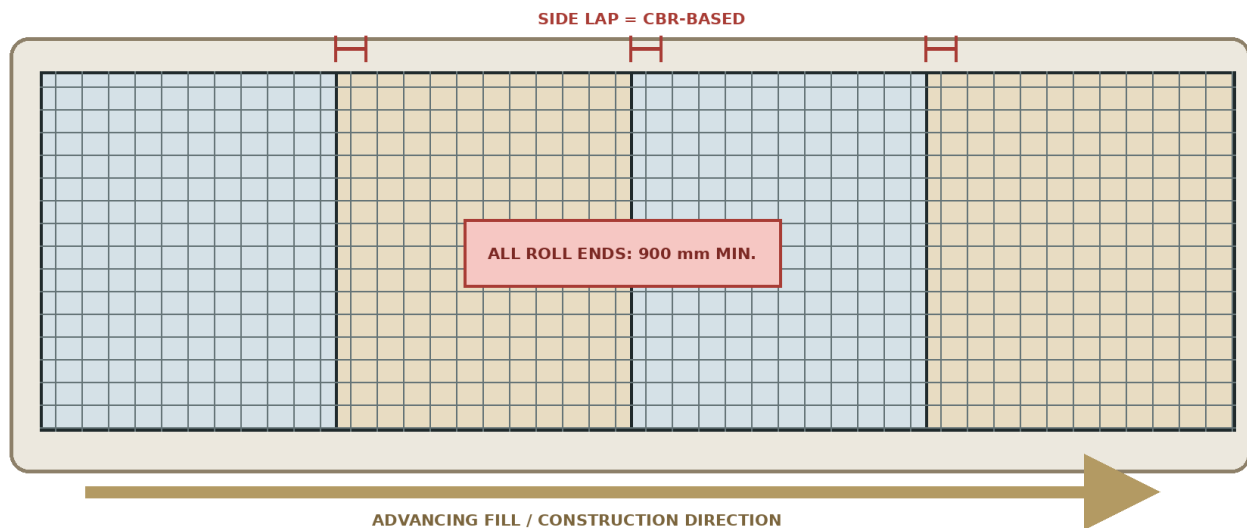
Typical overlap and shingling concept. Project drawings and authority requirements prevail.
